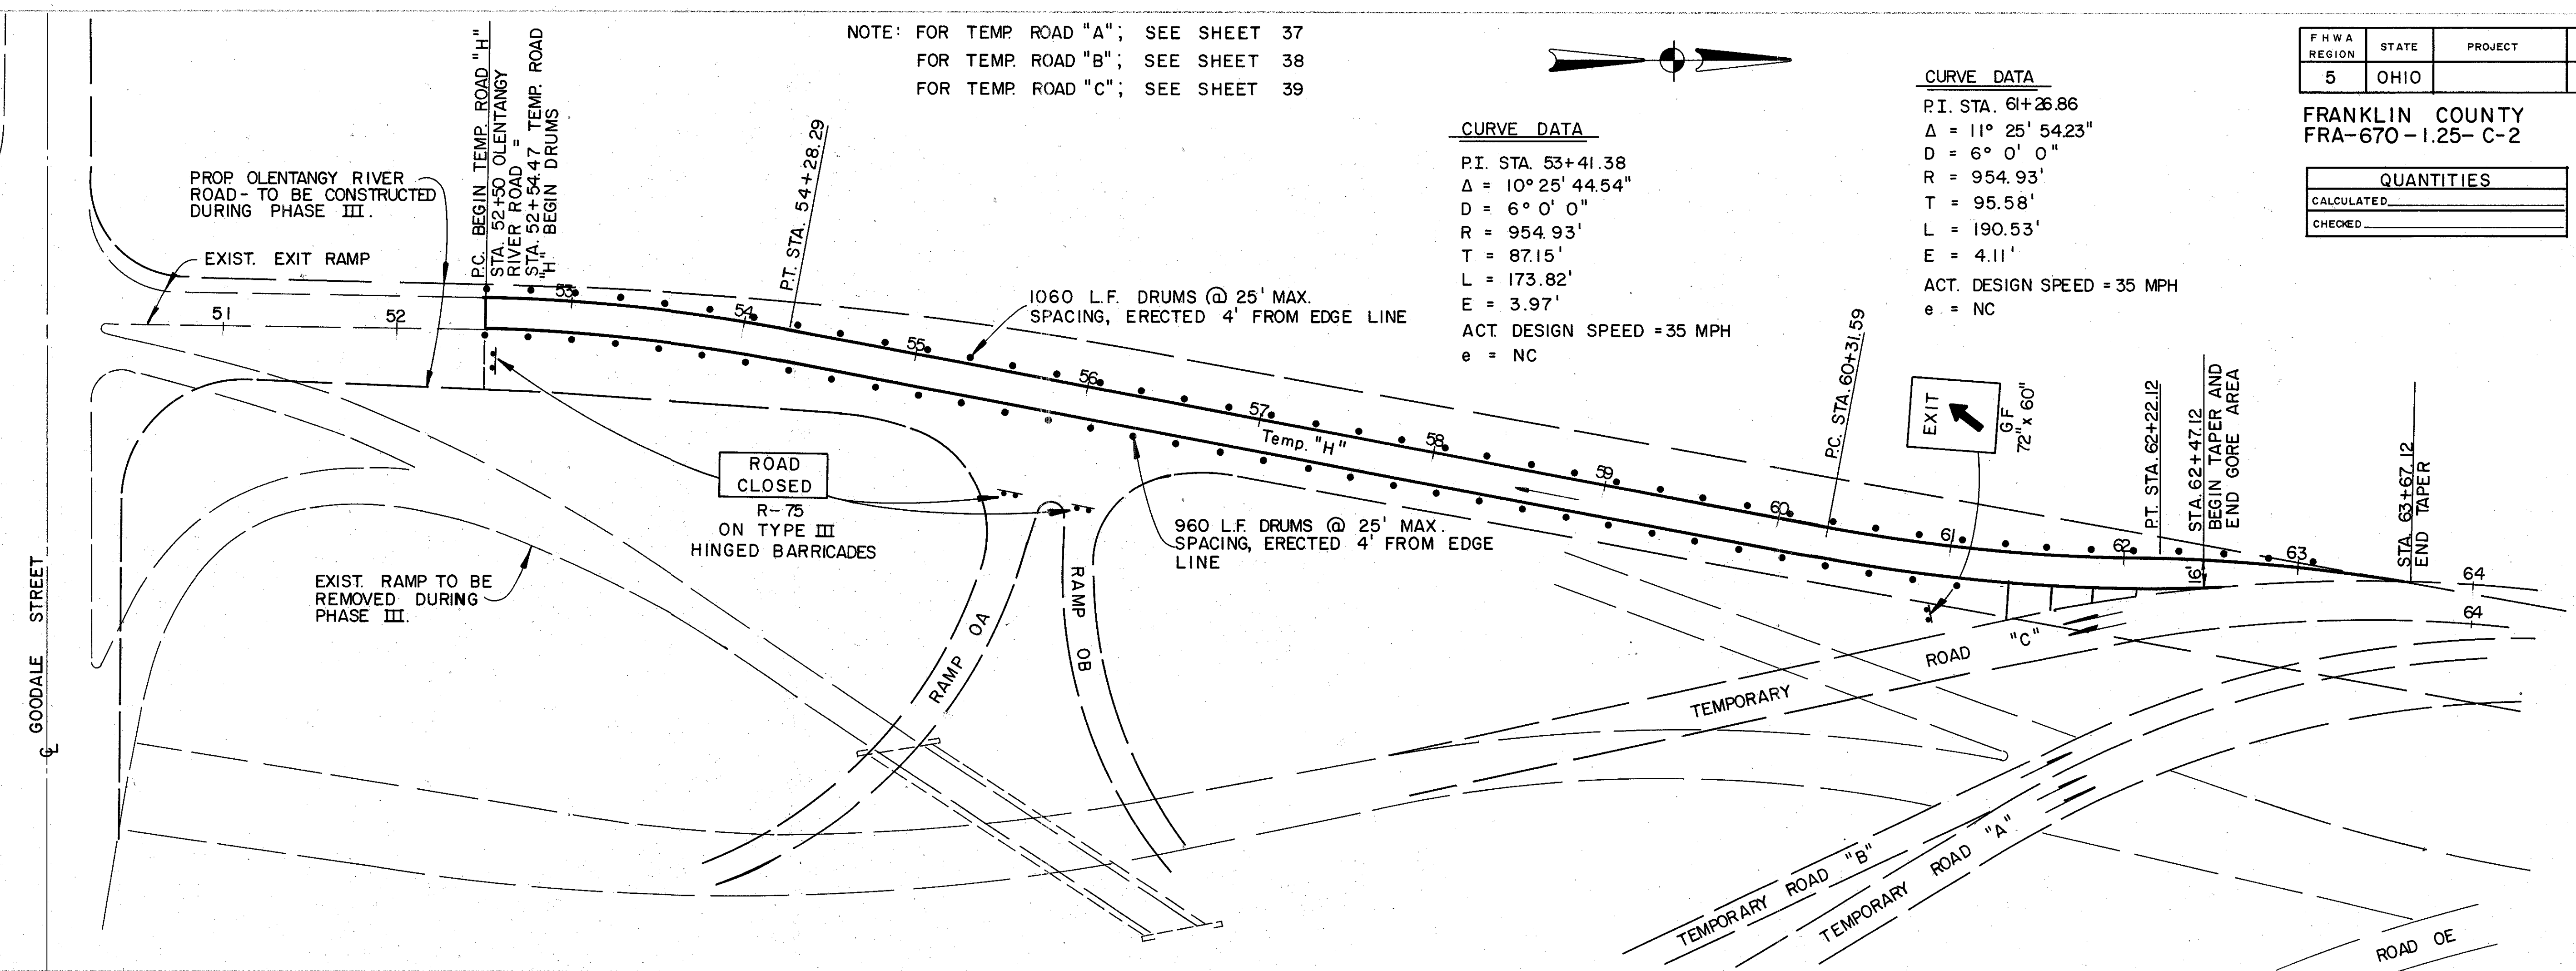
SINGLE PLAN AND CROSS SECTION-FULL LINE
